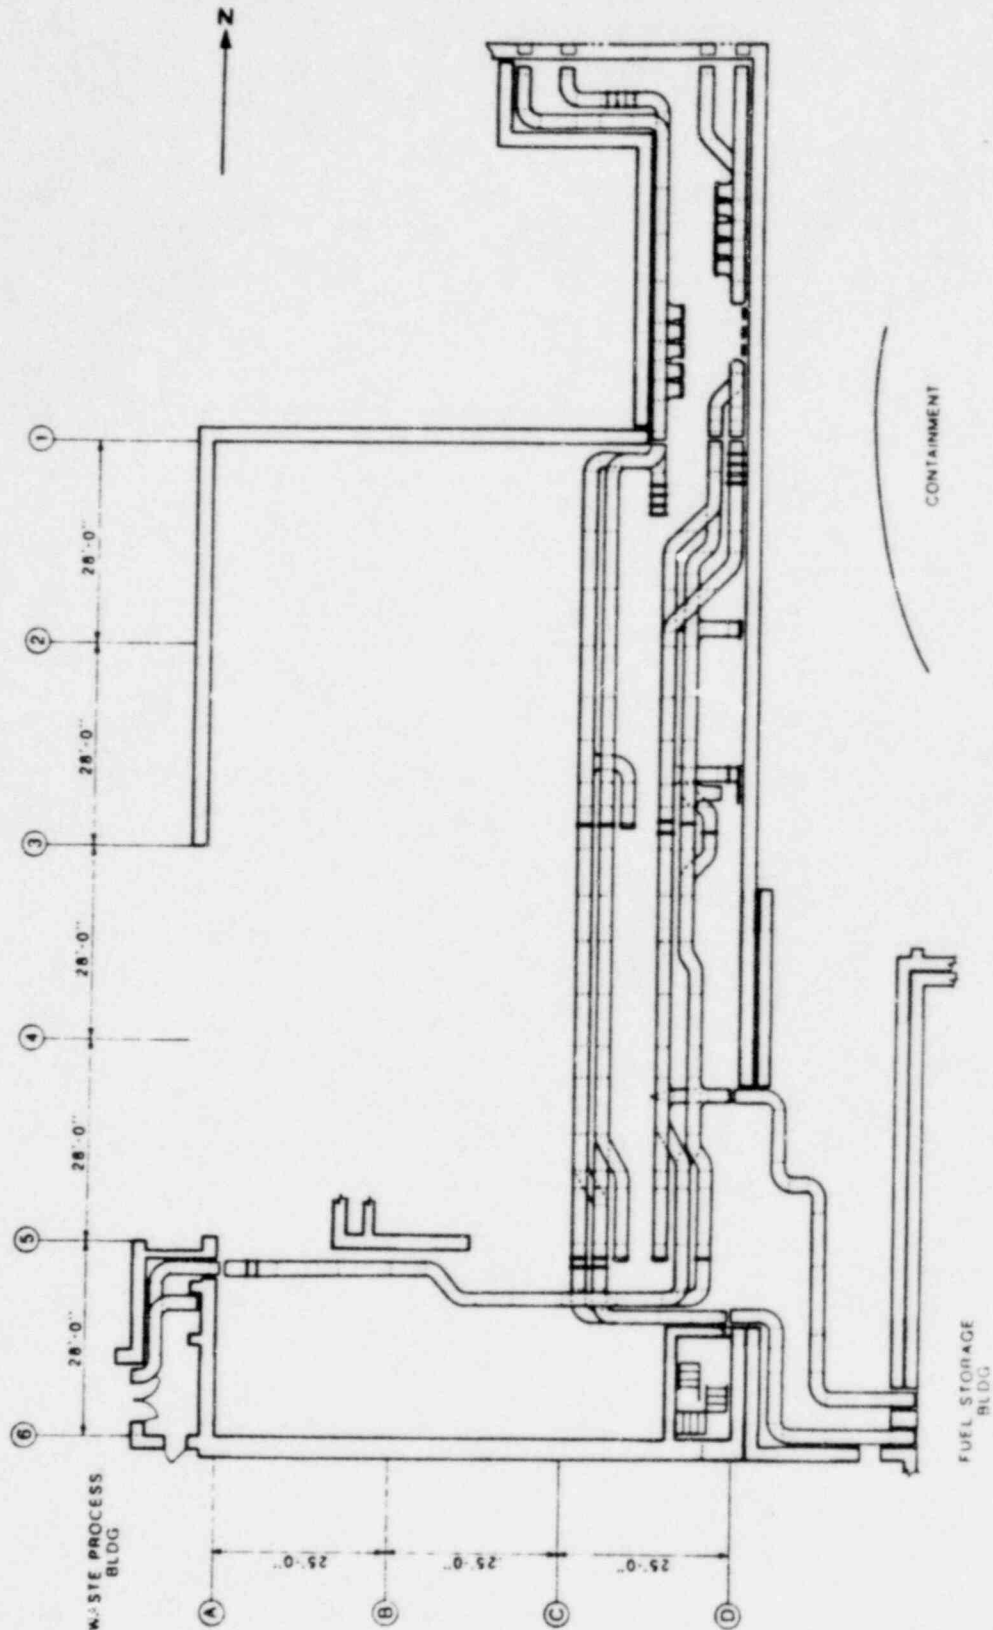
The typical configurations of cable trays in this area are double trapeze and floor-to-ceiling with up to 4 tiers.
